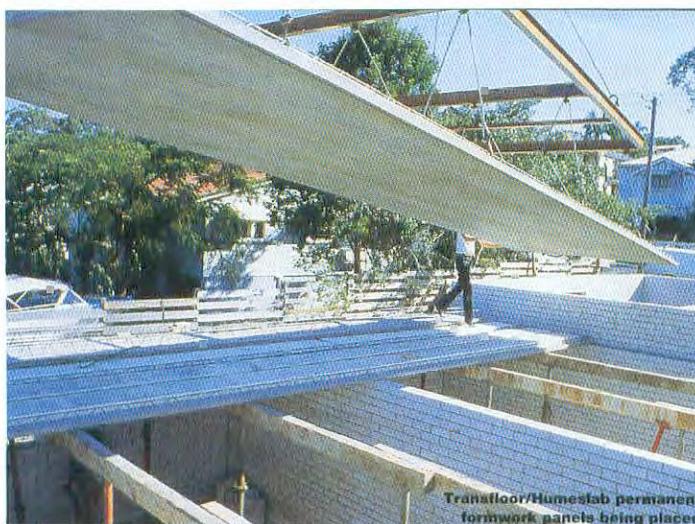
Permanent precast concrete formwork ('half-slab') floor units spans across an intermediate brickwork wall (Courtesy of Cement & Concrete Association of Australia)
